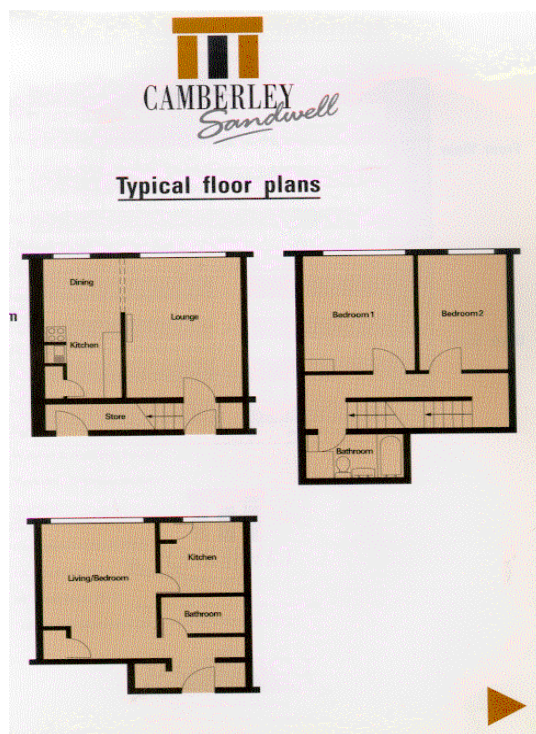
Tower blocks are more compact and have less floor-to walls ratio
